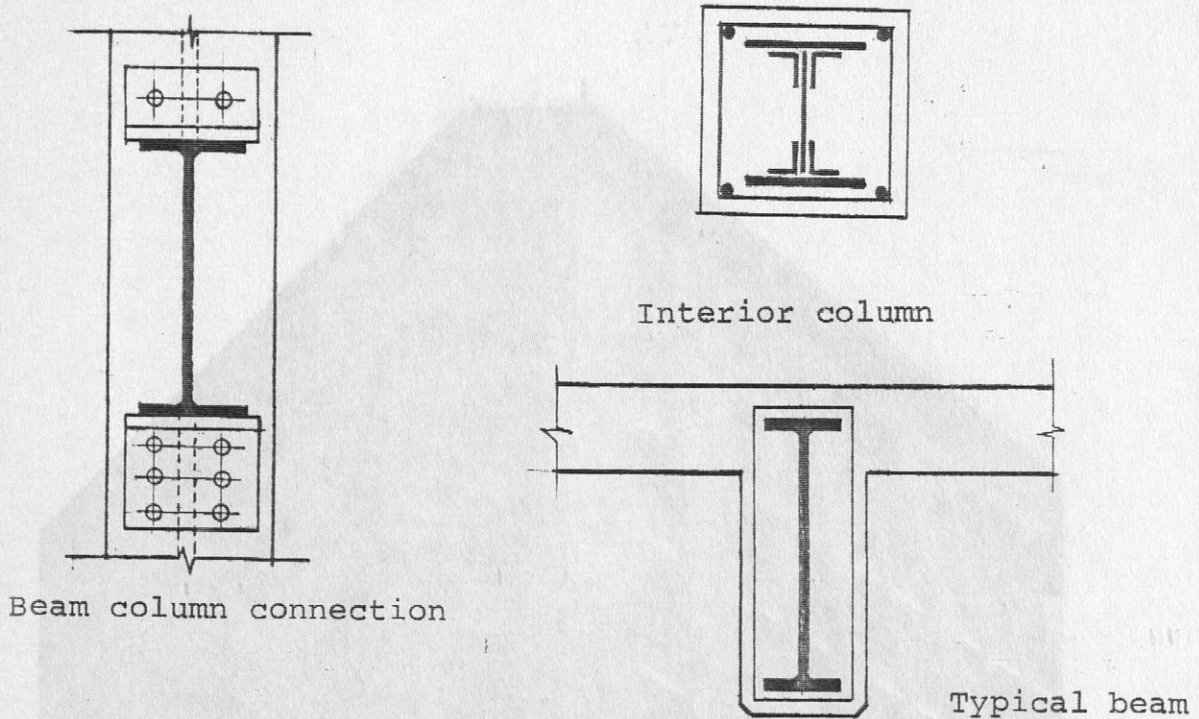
Typical Cross Sections of Beams and Columns in Building I
